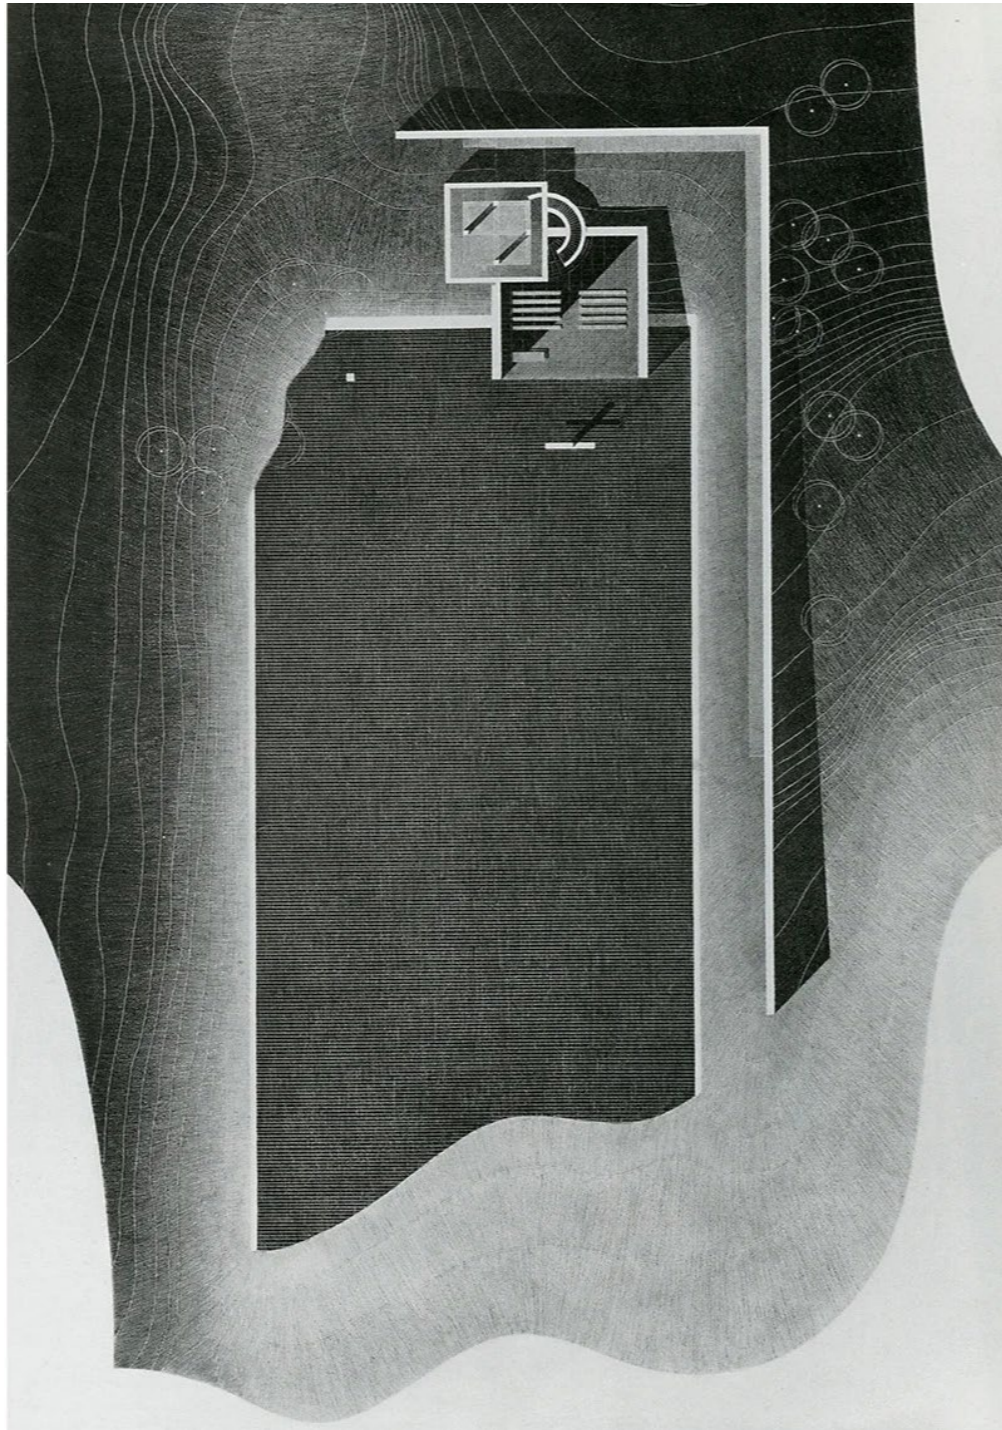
Church on the Water site plan. (ArchDaily, n.d.).
